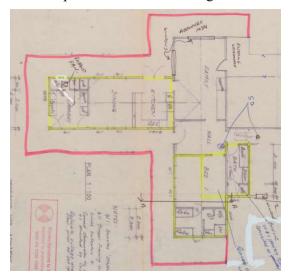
Extension as carried out, with new walls highlighted yellow and new parts of the verandah in red. (Shire of Buninyong, Building Approval No. 4977)
